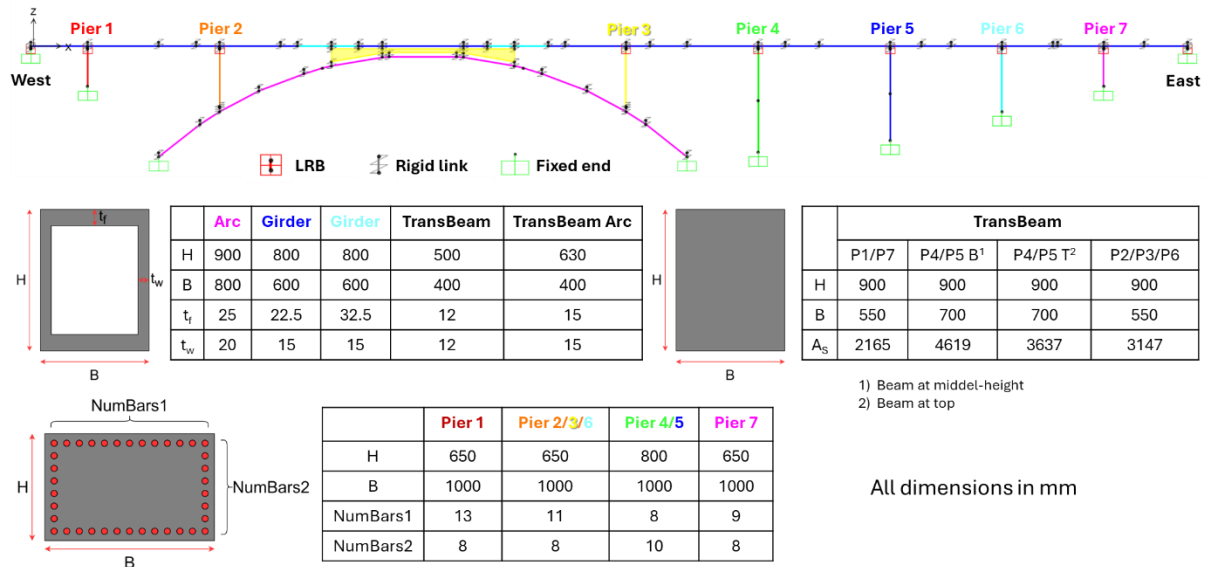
The Thjórská-Bridge: Side view of the SAP2000 model showing details of the cross-sections in girders, arch and piers, as well as their transverse beams.
